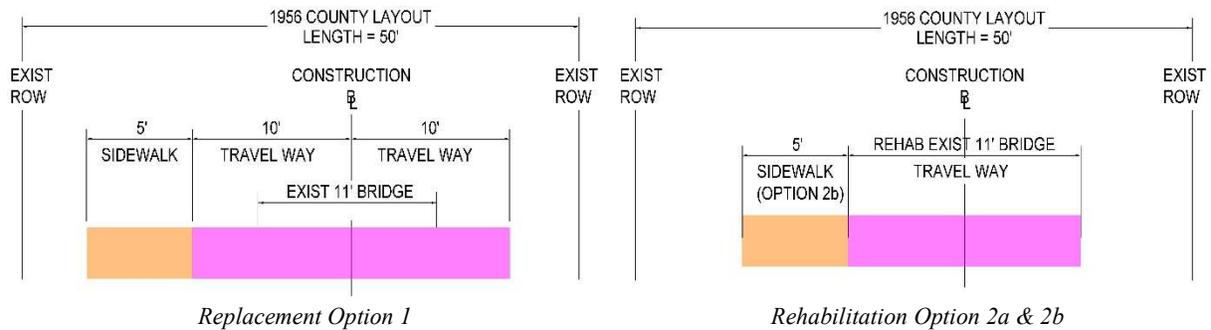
Typical Bridge Section Improvements for Massasoit Bridge
